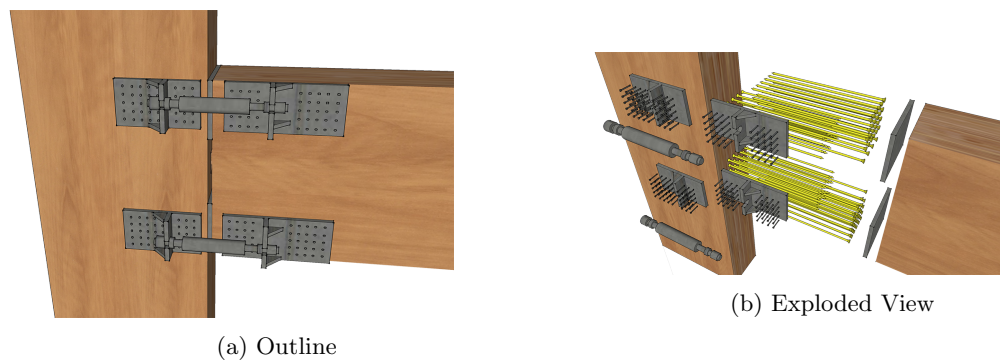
Details of screw reinforced joint with riveted Plug and Play dissipaters
